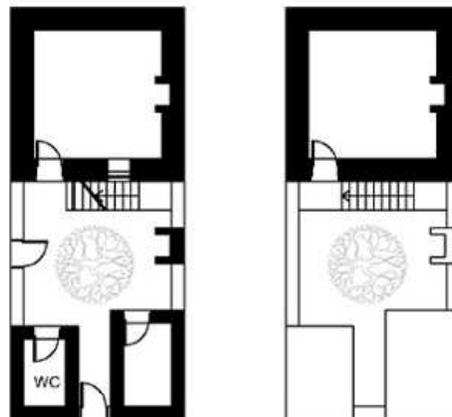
House type 2: ground floor plan (left) and first floor plan (right) (Drawings by author)
